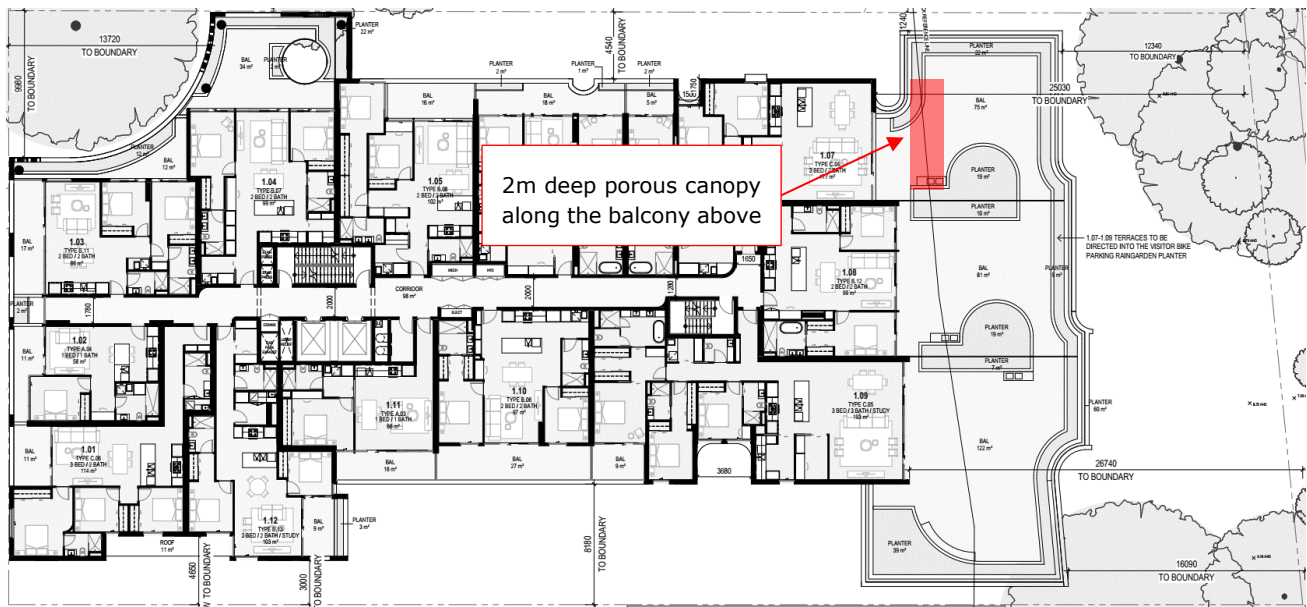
Recommendations for wind amelioration overlaid on the Level 1 floor plan.
